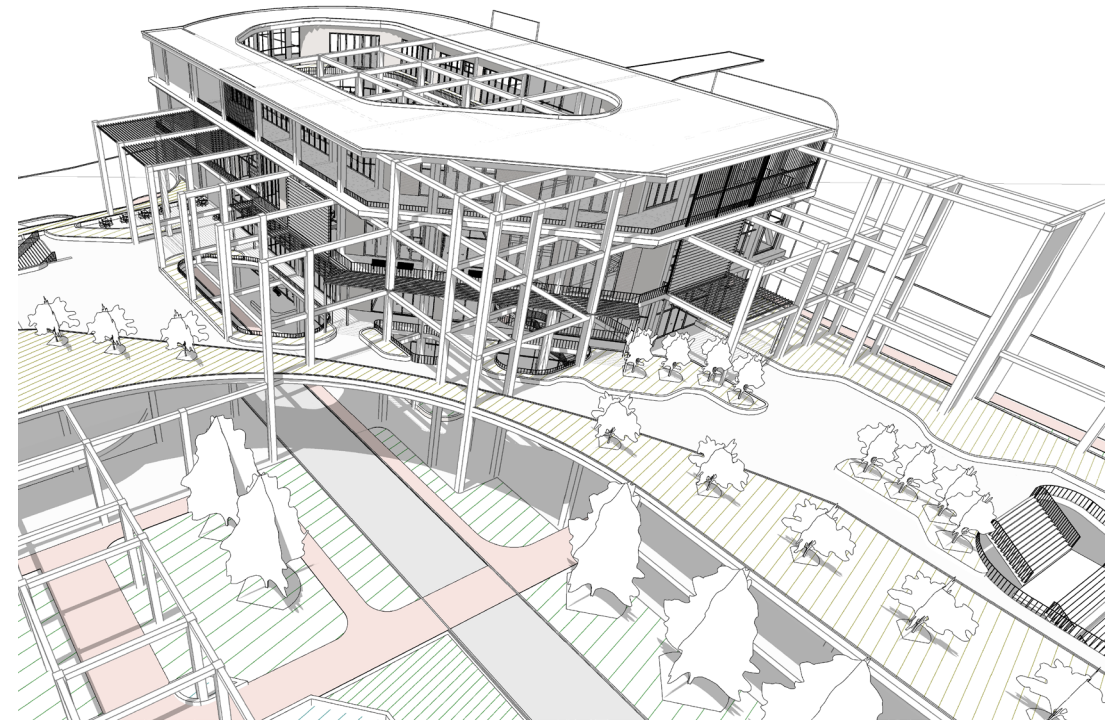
NORTH FACADE- DATA CENTRE (AUTHOR 2021)
